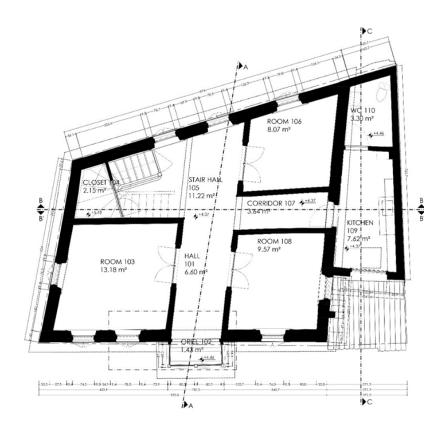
First floor plan of the house in Basmane (Source: Düzalan and Açan, 2016)
